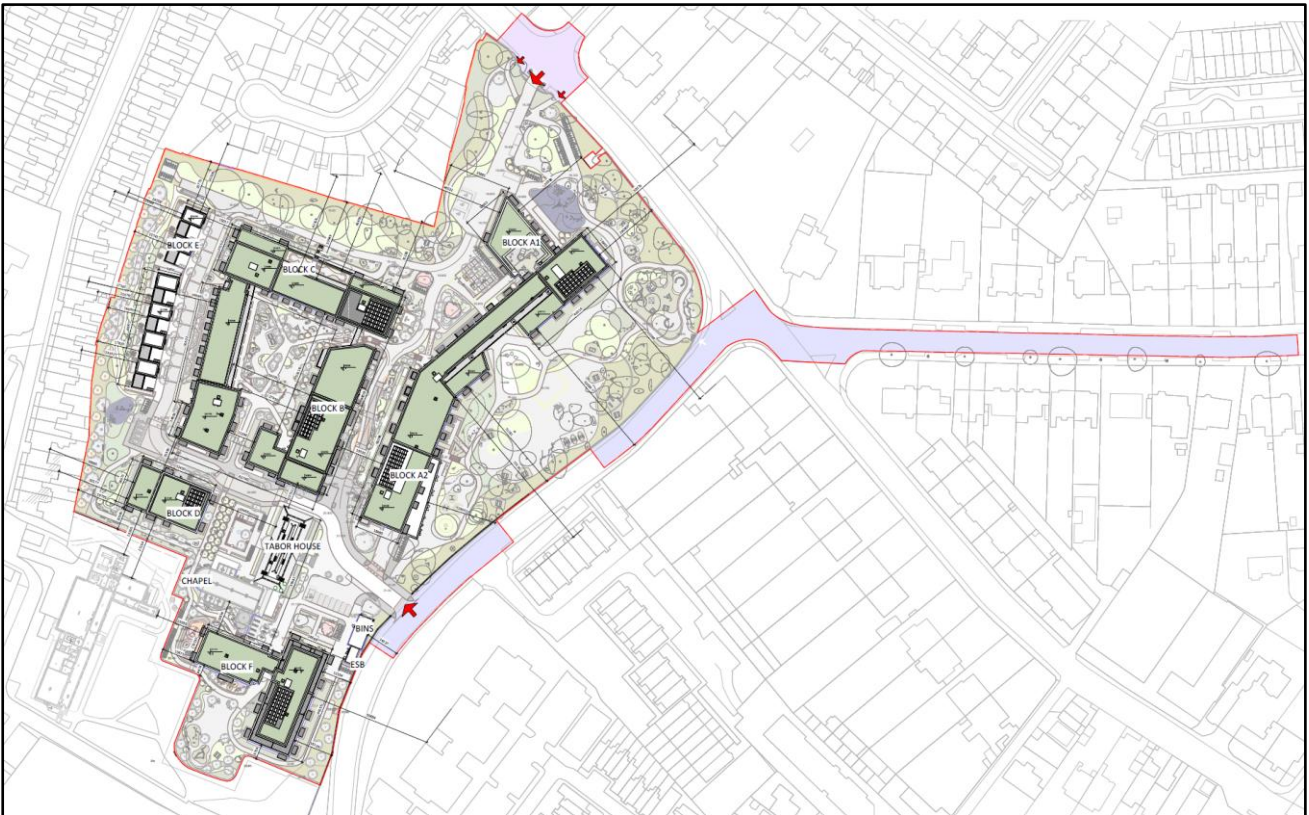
Proposed Development Site Layout (Source OMP Architects 2025)
